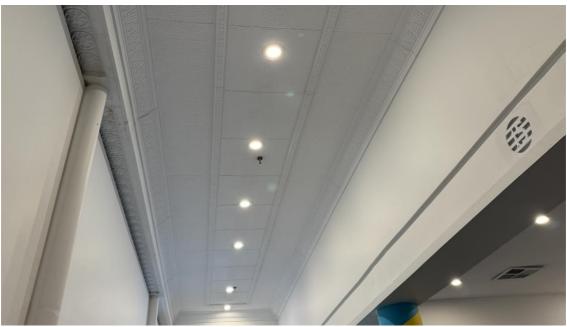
Remnant second floor pressed metal ceilings and bulkhead detail
